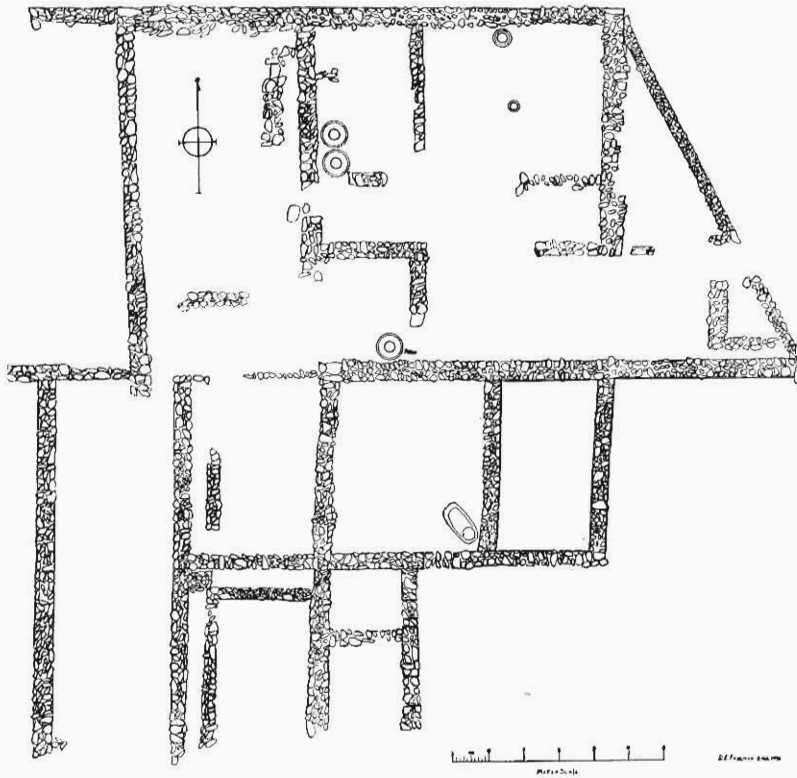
PLAN OF HOUSE ON SOUTH HILL
